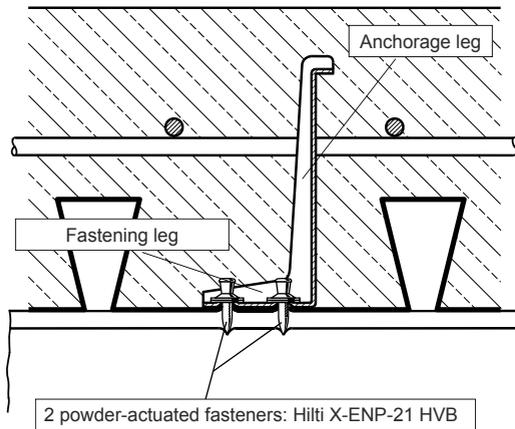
Shear connection in composite beams with Hilti X-HVB shear connector
